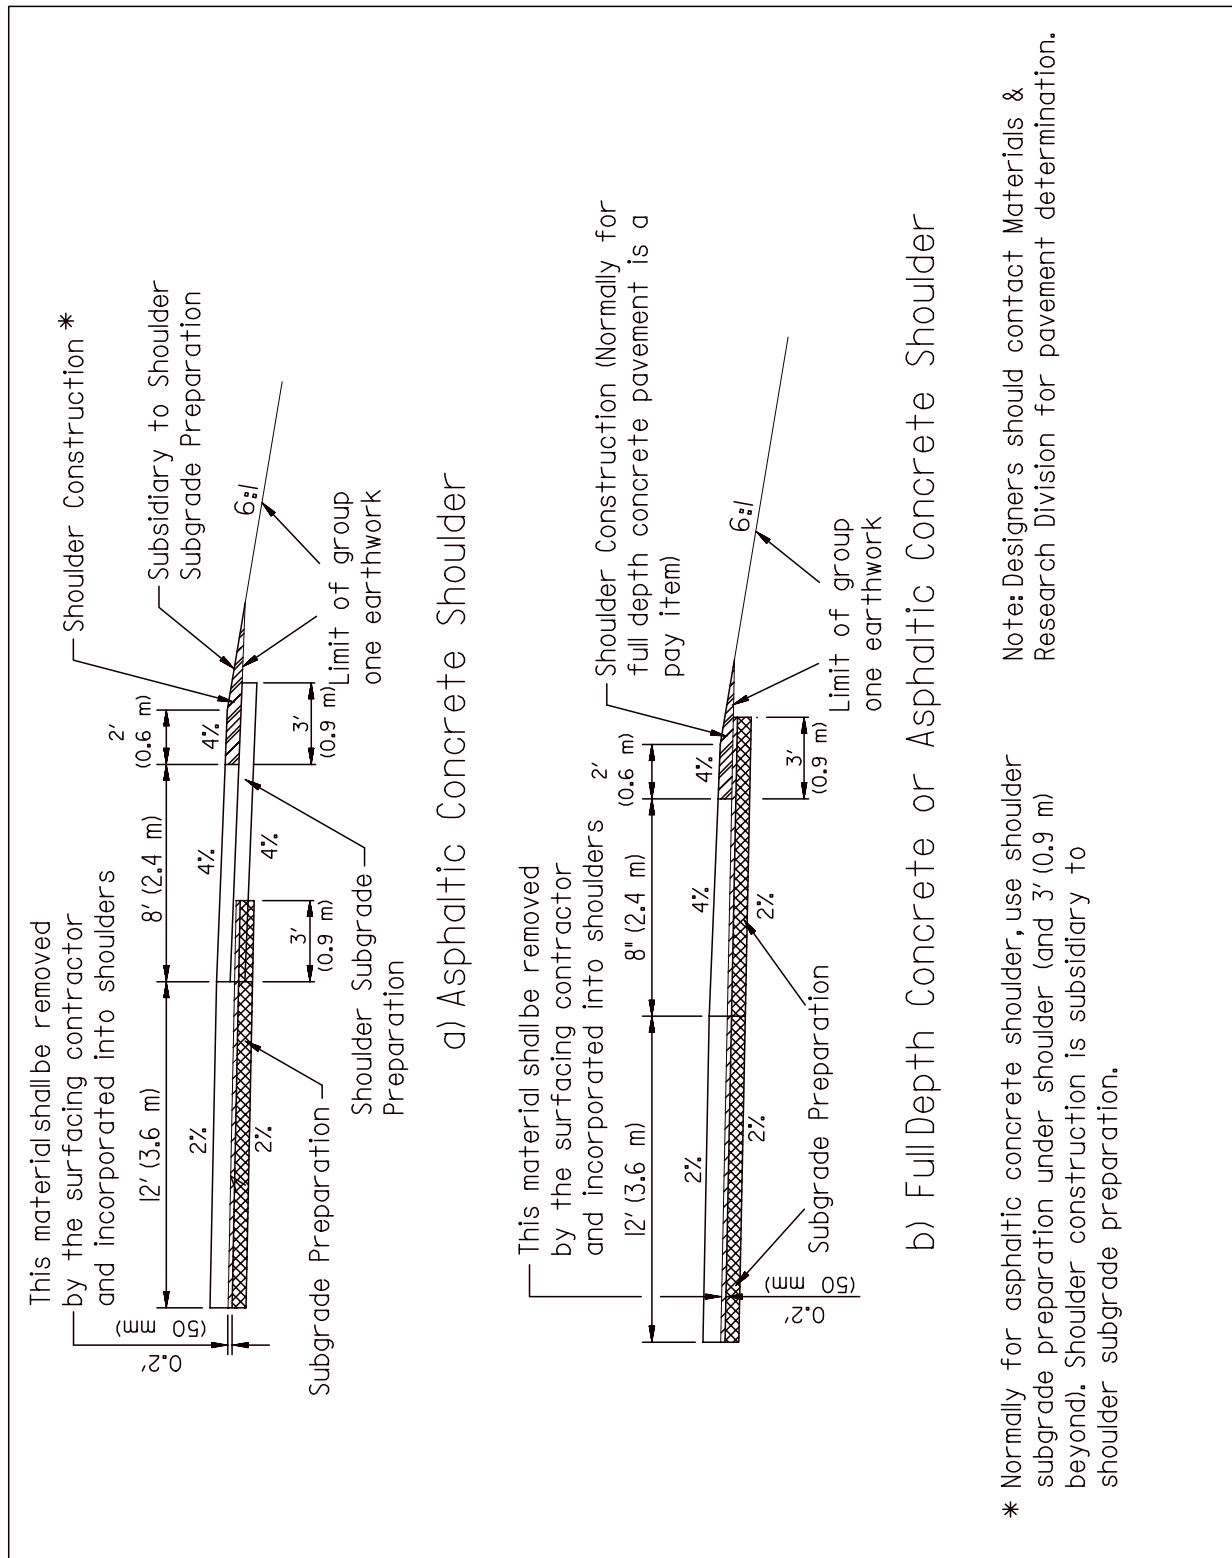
Typical Shoulder Construction (Uncurbed Section)
